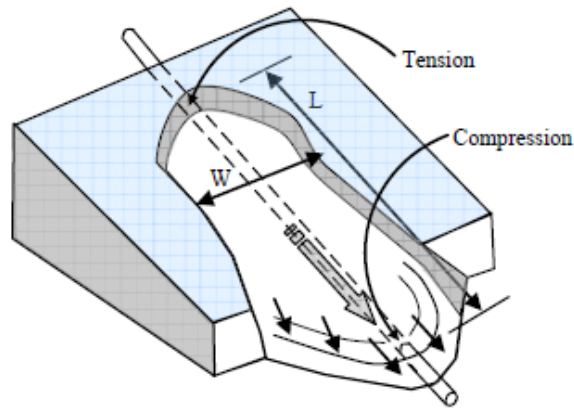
Longitudinal permanent ground deformation; pipeline crossing permanent ground deformation zone in the direction of ground movement.
